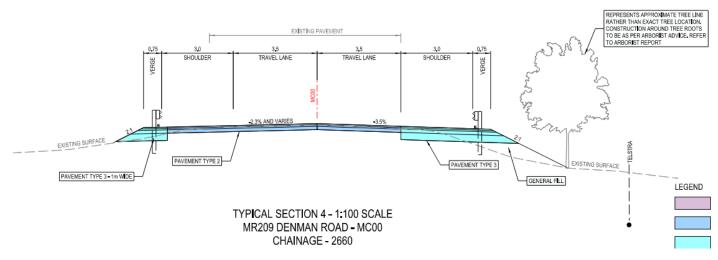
Typical cross section (detailed design) – immediately south of the Ramrod Creek culvert
